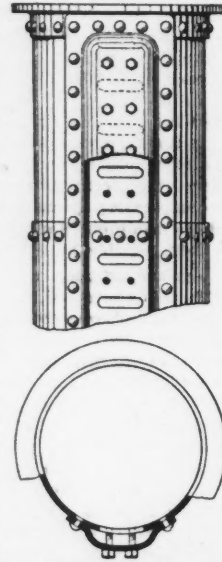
Sketch Showing Ladder Construction in Caisson Shaft.
